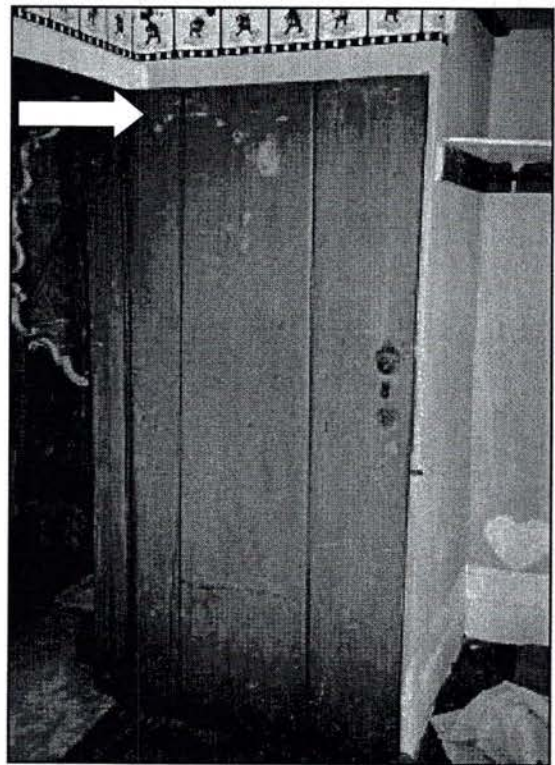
Recycled, hand planed, board and batton door in Room 207 (open). Ghosting of strap hinges can be seen at the top and bottom of the door.
